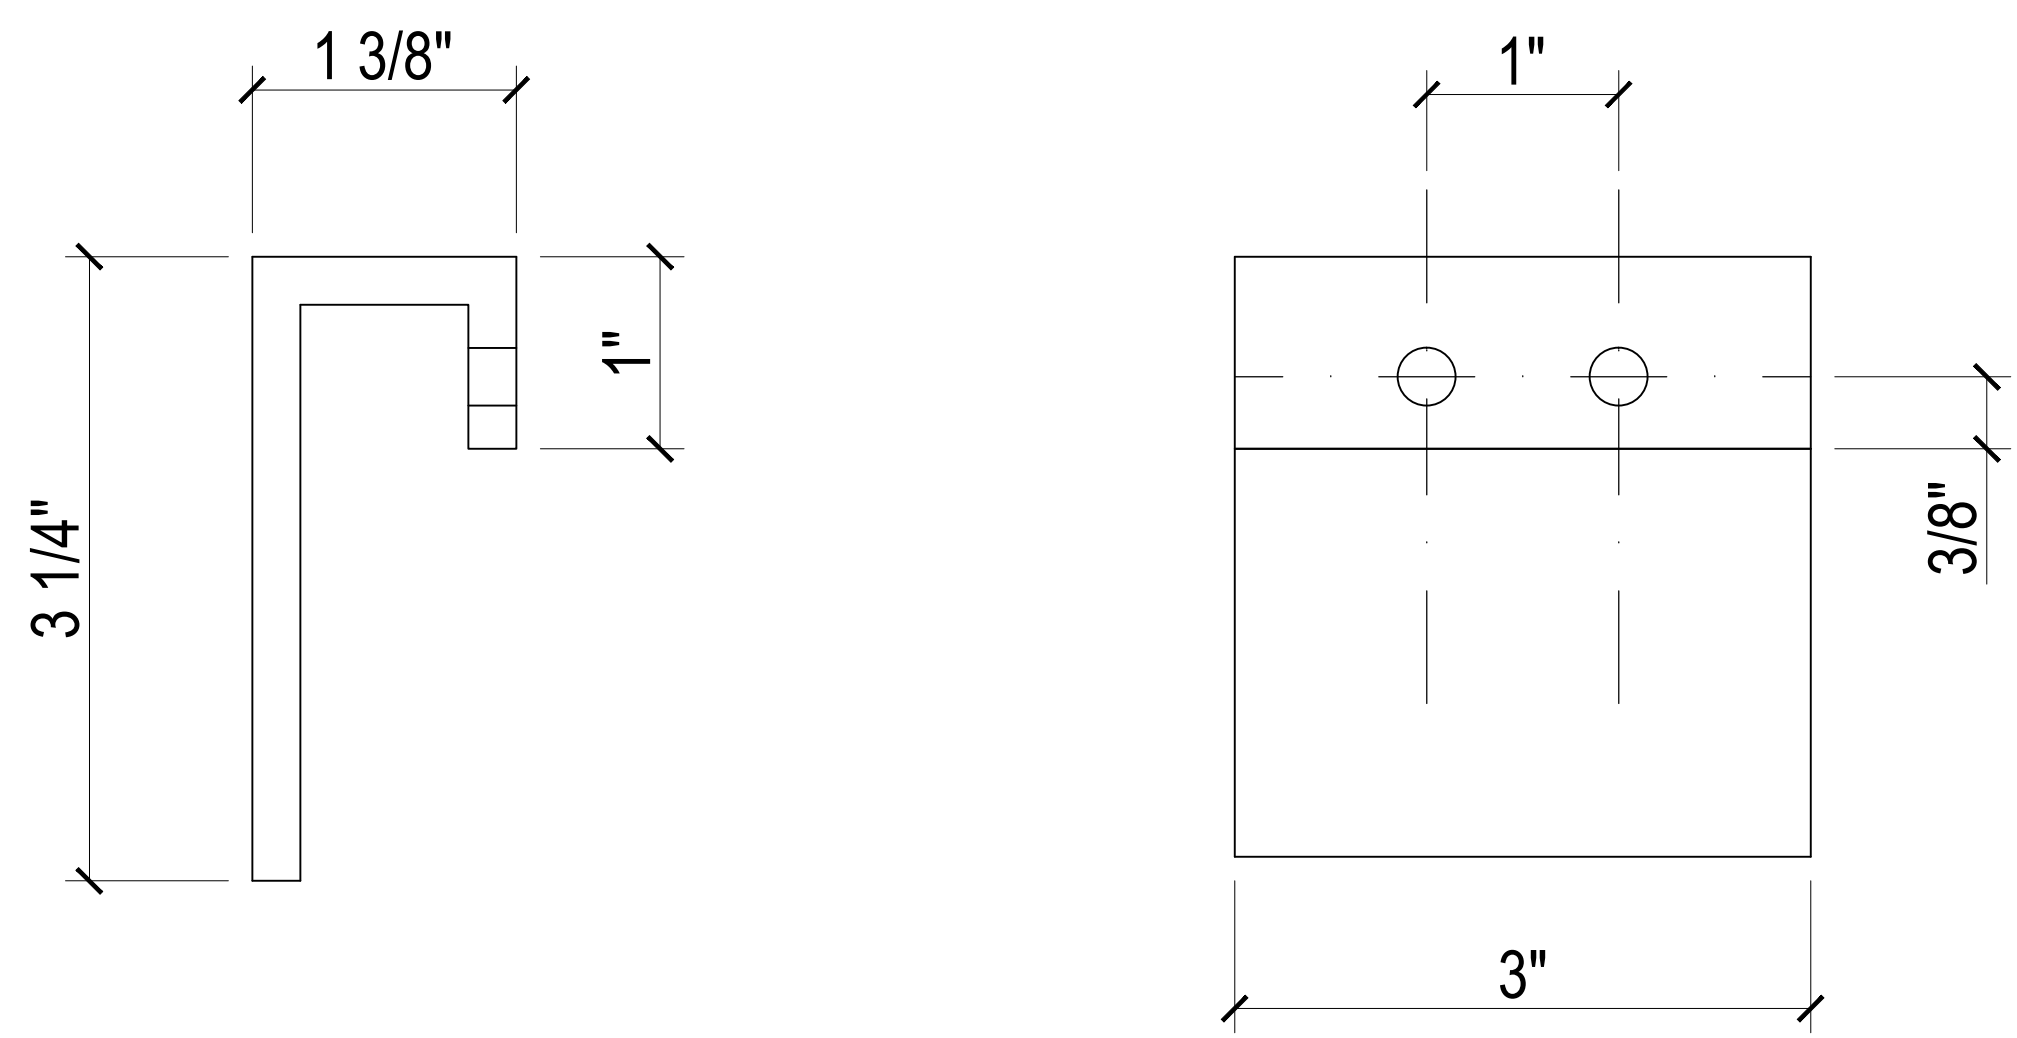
DETAIL - TYPICAL DRAFT CURTAIN MOUNTING
